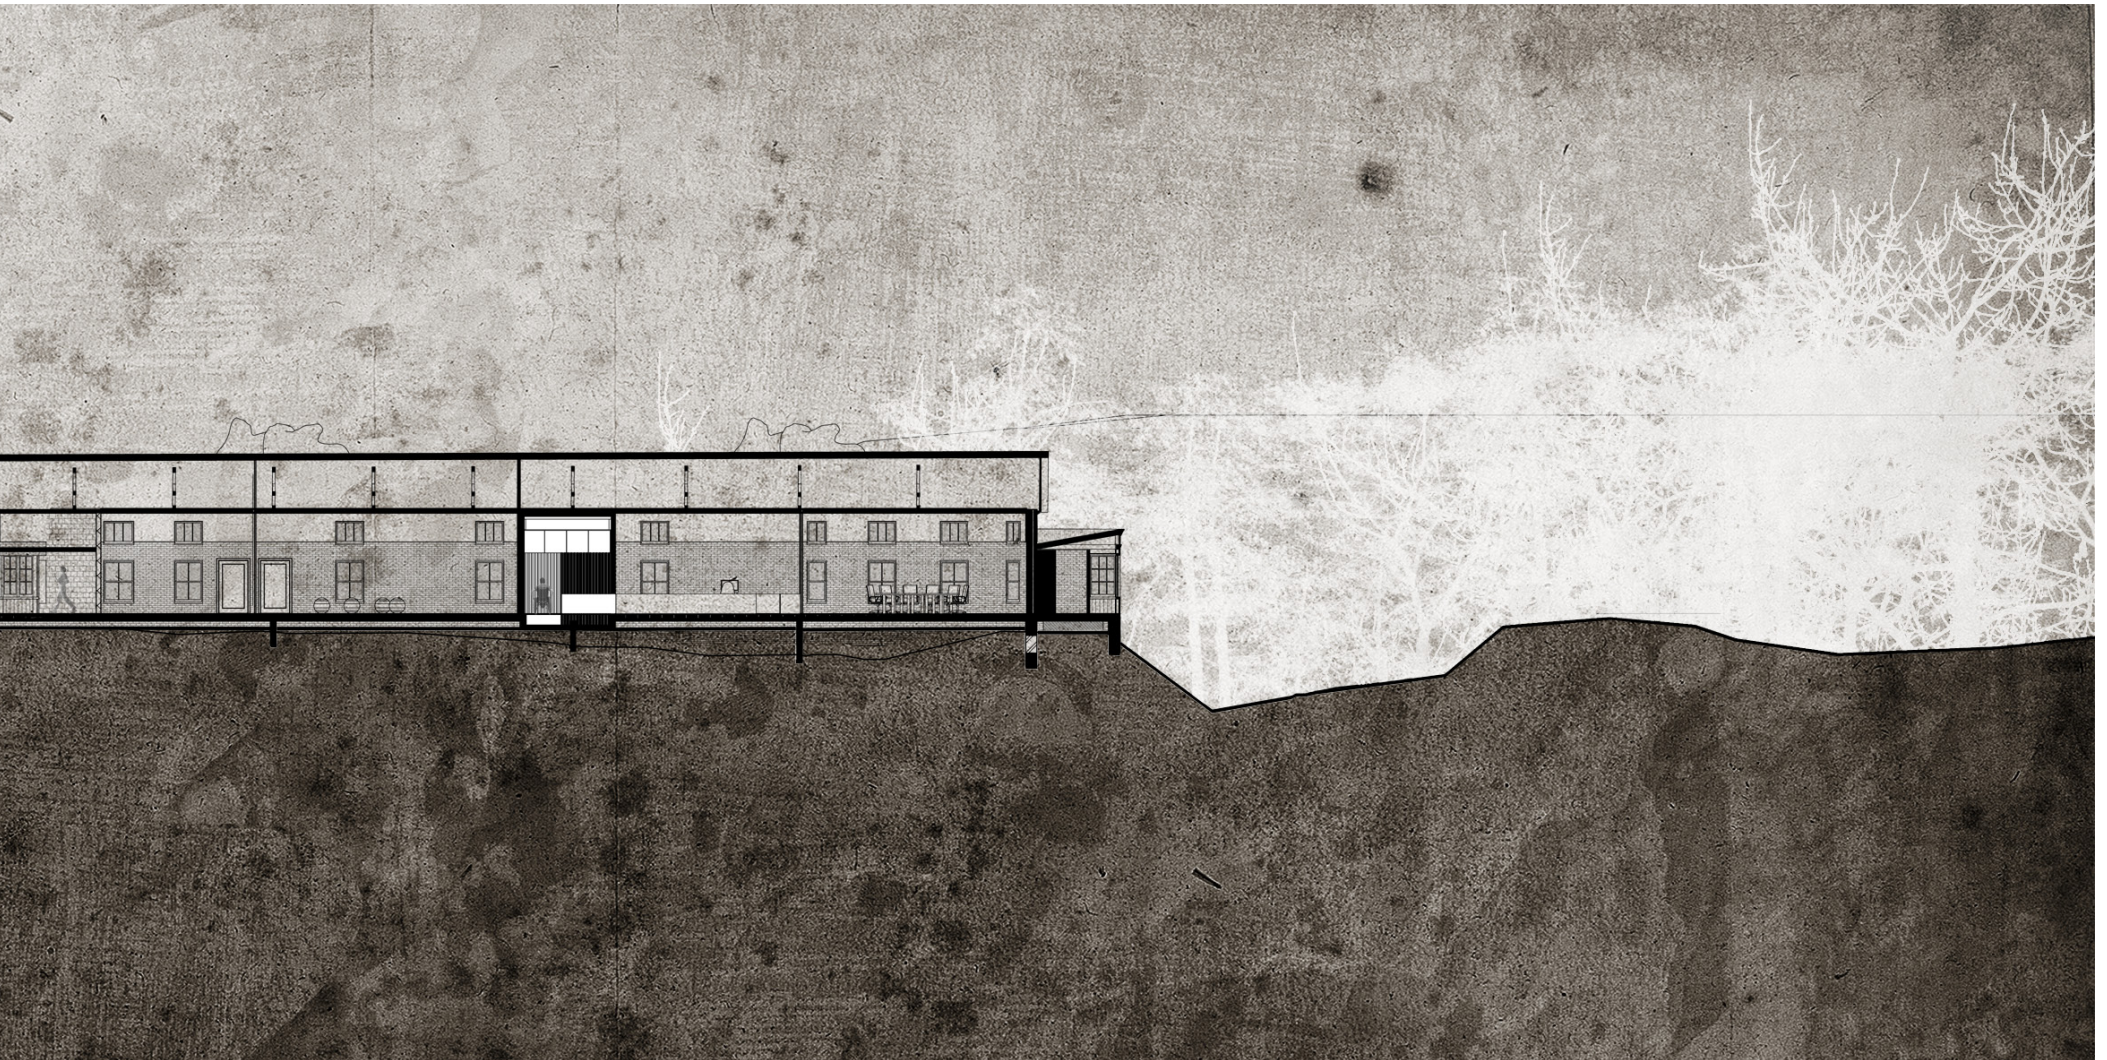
Entrance to site looking at L to R, reading room, accommodation and lounge.
